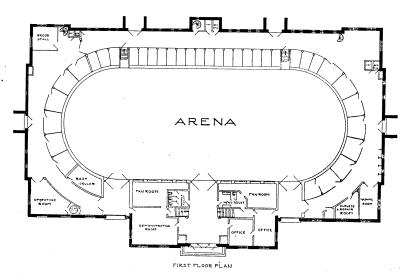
First floor plan of the live stock pavillon, showing stabling arrangements and offices.
